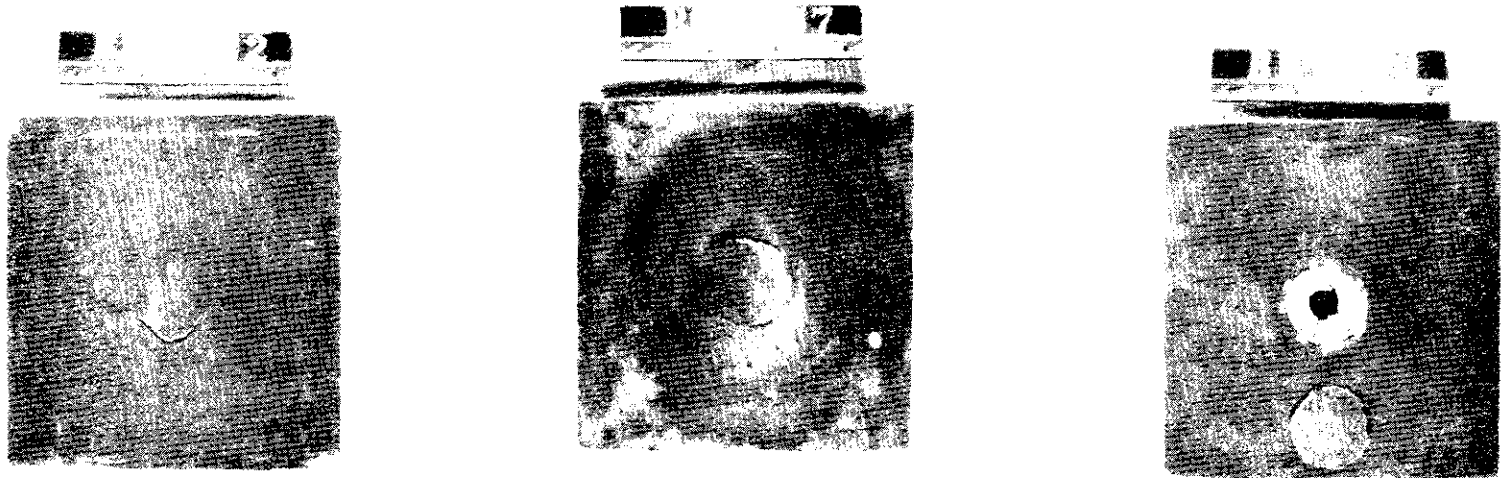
TYPICAL FAILURES ON TENSION FACE OF 18 x 18 - INCH STEEL PLATE RESULTING FROM CHARGES IN EXCESS OF SHOCK LIMIT.
